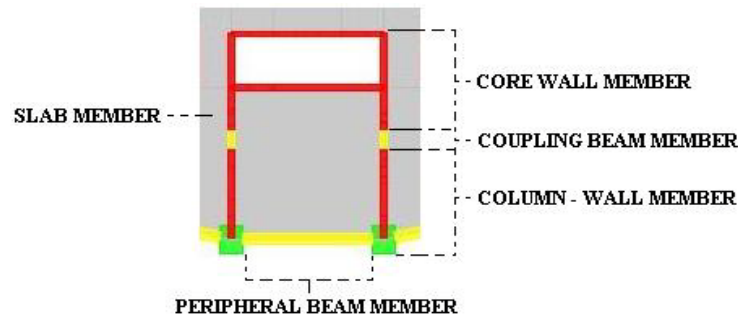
L3 - Plan view of central bottom core detailing structural elements
